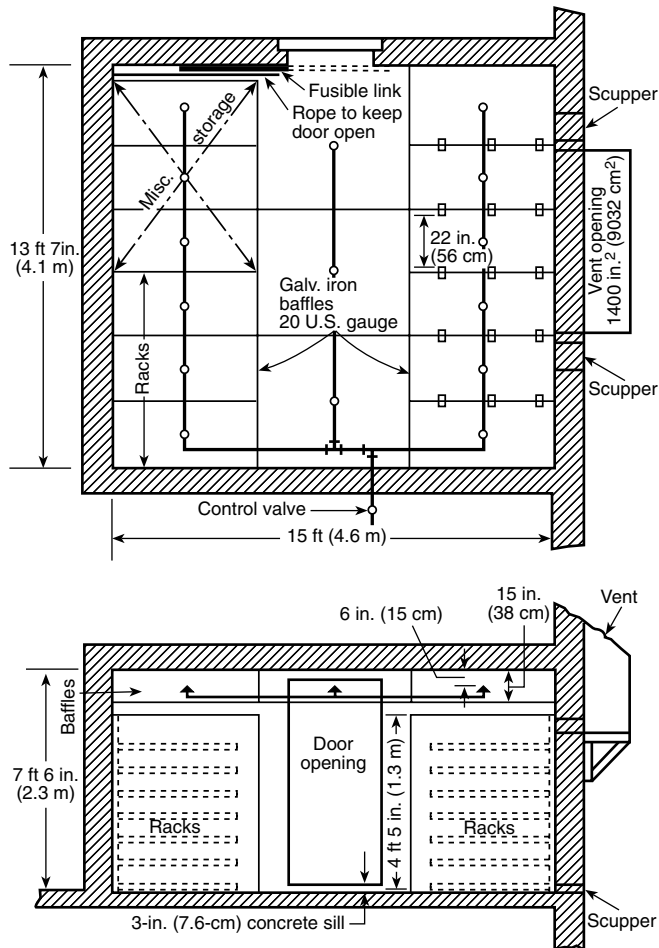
(a) Raw stock storage vault showing general arrangement of sprinklers, racks, and baffles.
